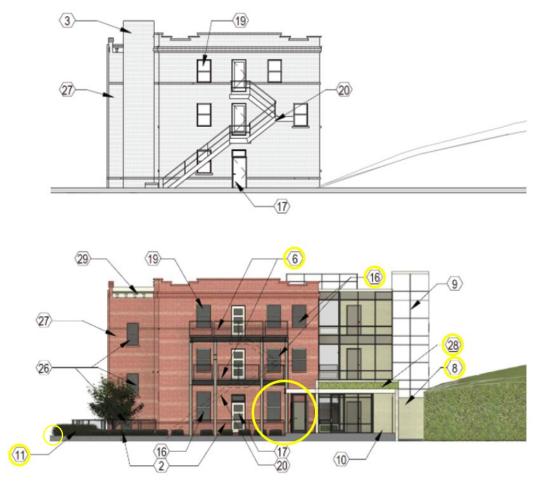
Existing (top) and proposed west elevation of 2543 4th St. Numbers noted in narrative highlighted. New window and door opening indicated by staff.
